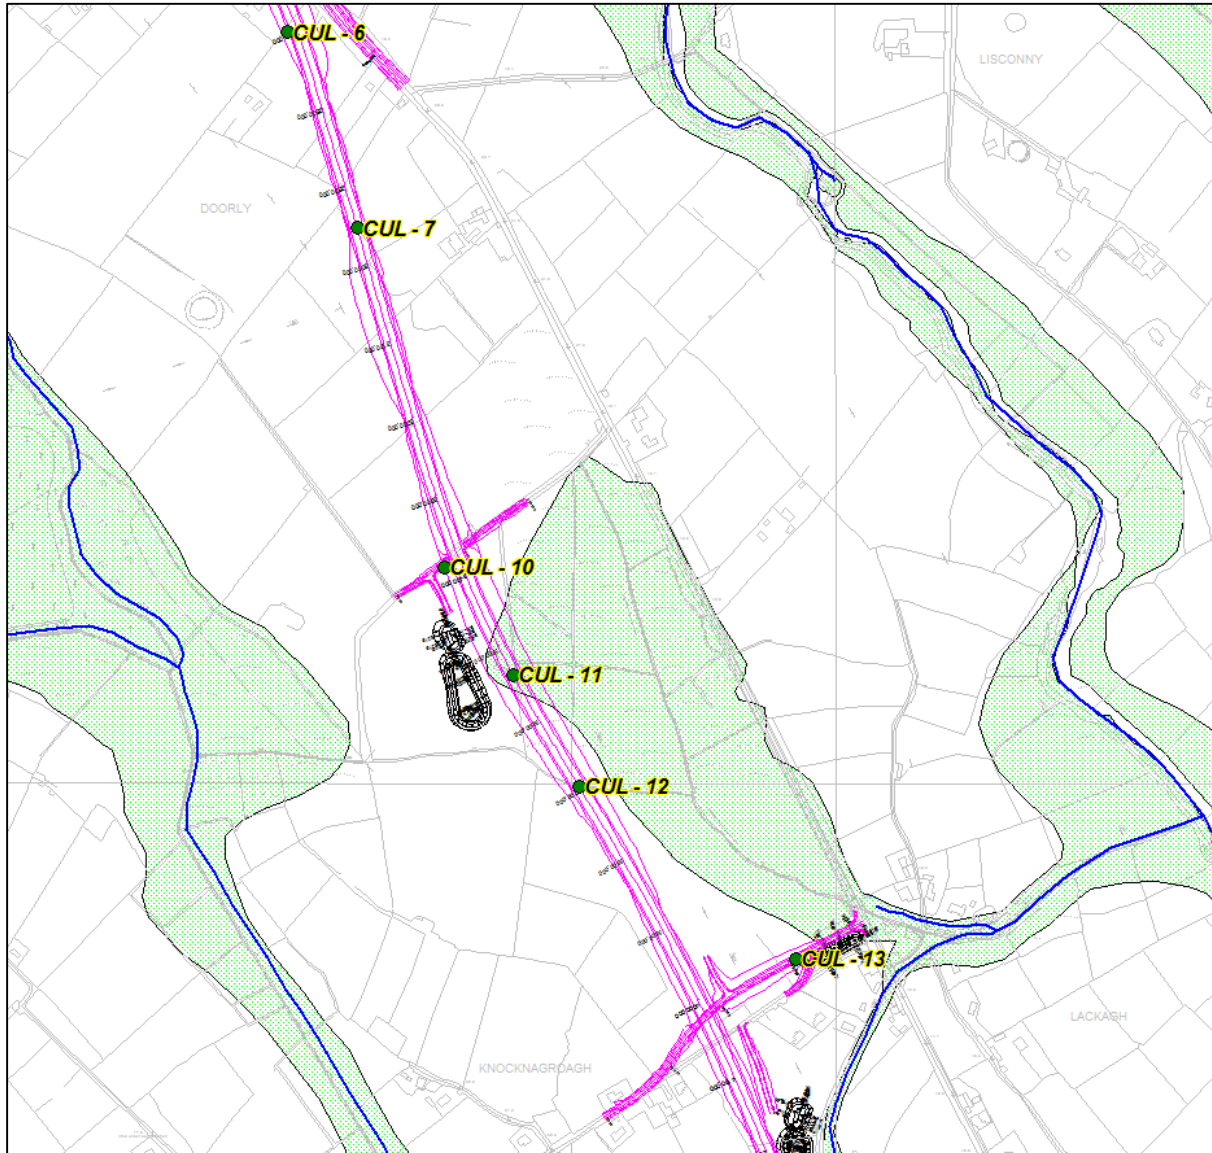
Watercourse Crossings and Arterial Drainage Benefitting Lands
